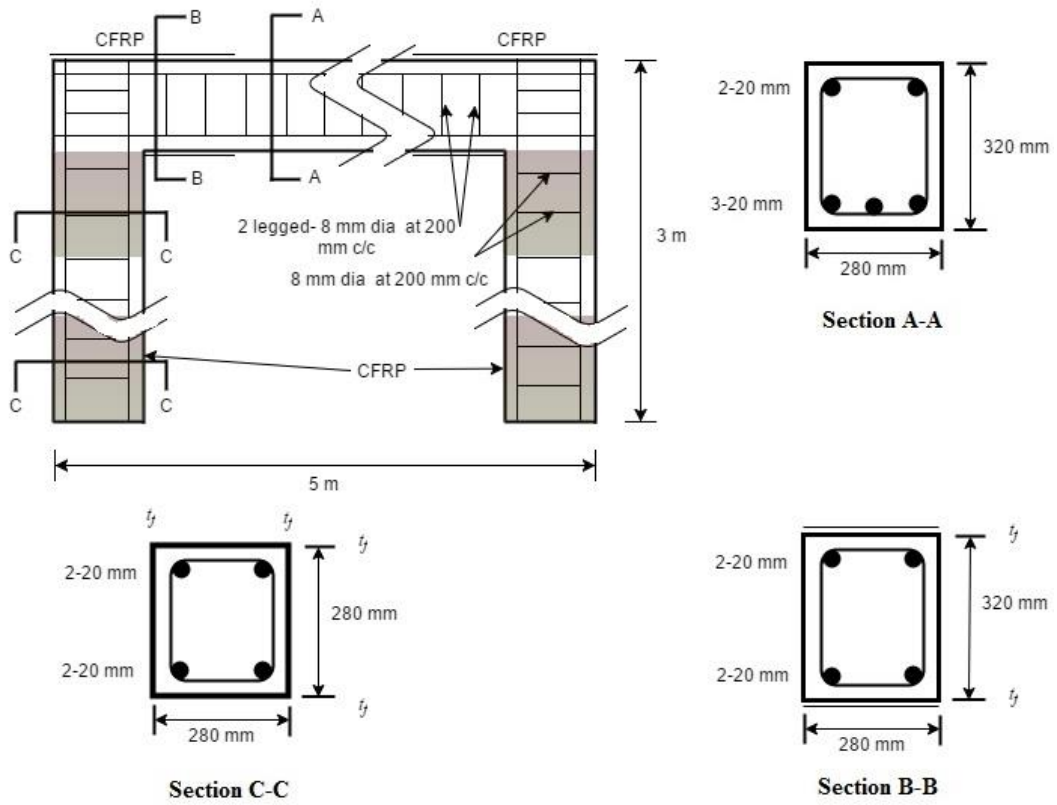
Details of strengthened portal: column and beam reinforced with CFRP
